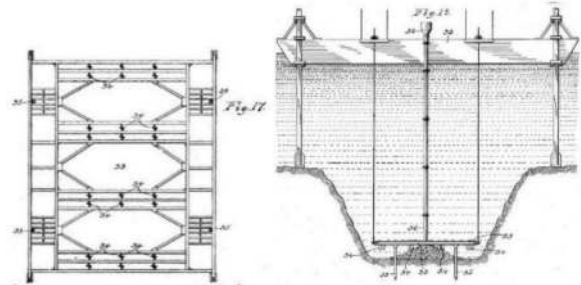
Grillage (left) & the tremie installing the concrete below the steel grillage (right).
